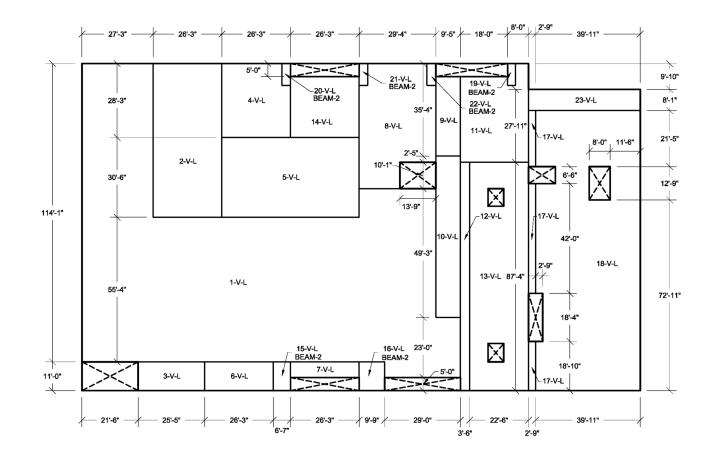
H.3-34 Elevation 35 Looking Down North-South Reinforcement Zones Near Side Face
